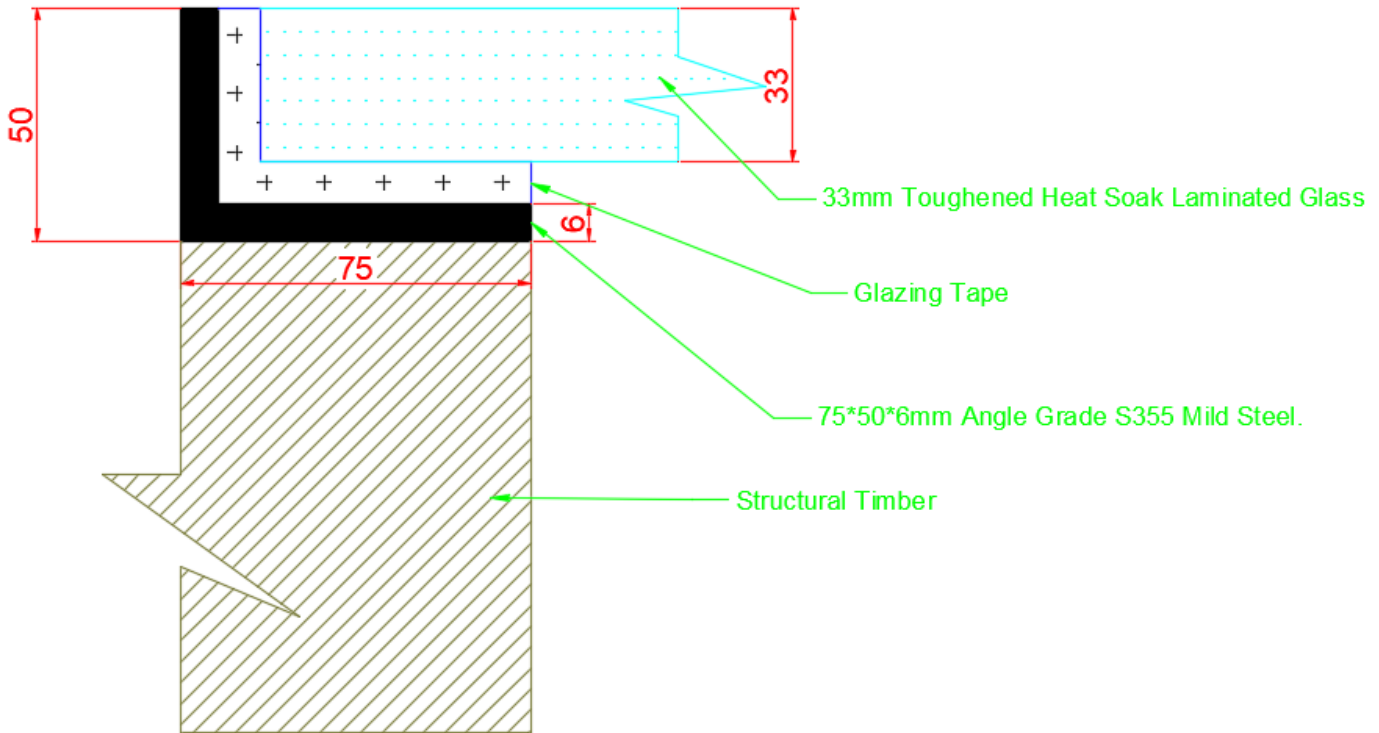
SHOWS AN ELEVATION SKETCH
